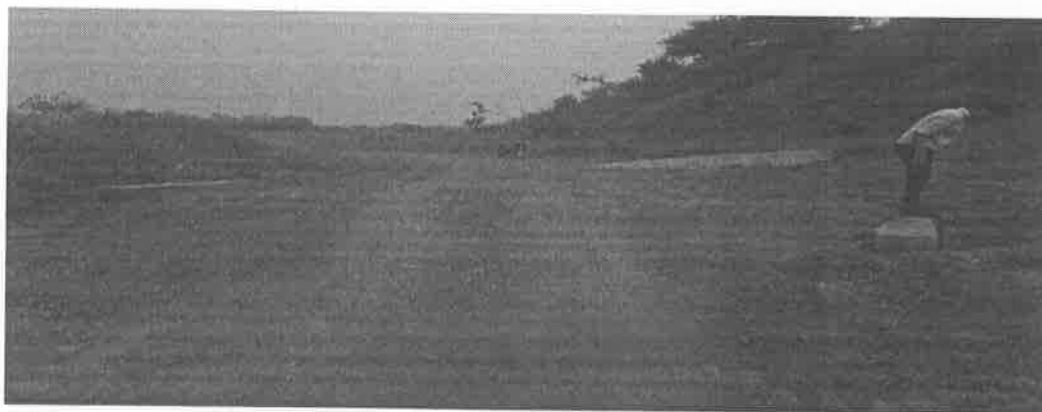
Constructed Culvert on the East side of Ash dyke at village Tundri
